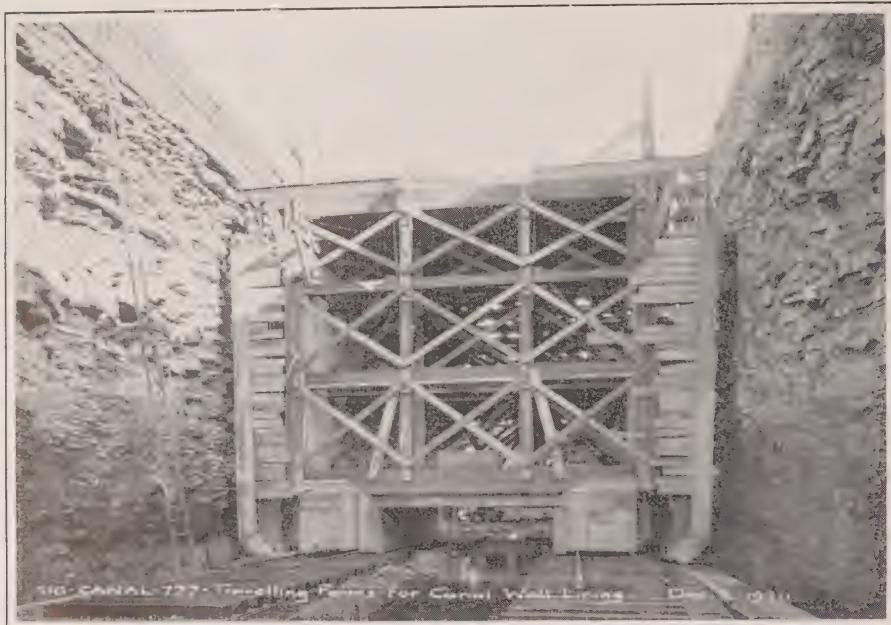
View Showing Travelling Forms for Canal Wall Lining
